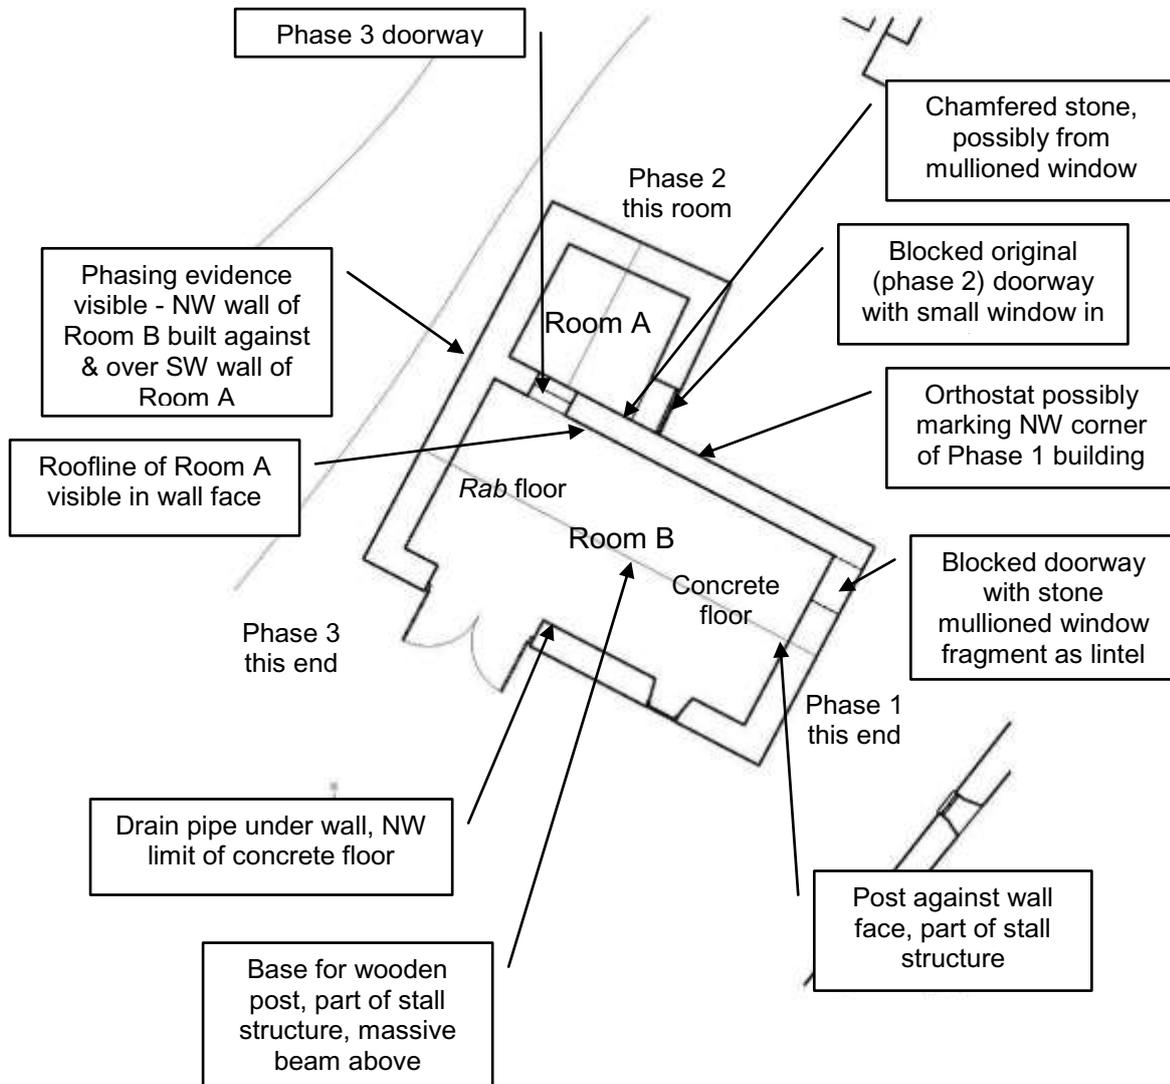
Plan of Barn 3 – 1:100 (Andy Travers, ATA Practice)
